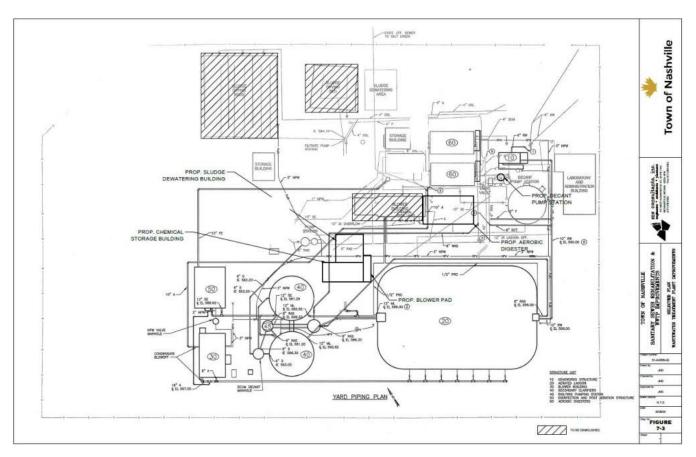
Selected Plan: WWTP Sludge Improvements
